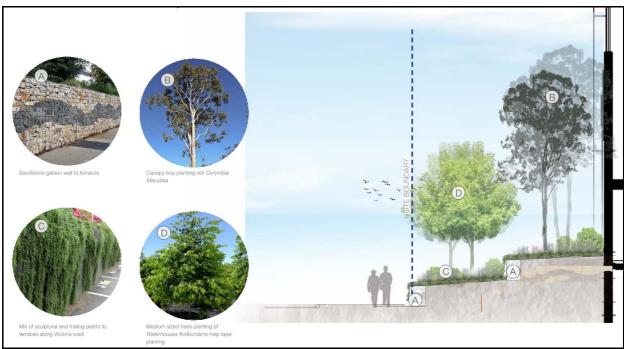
Landscape Plan Side Section (Source: Site Image, 2021)
